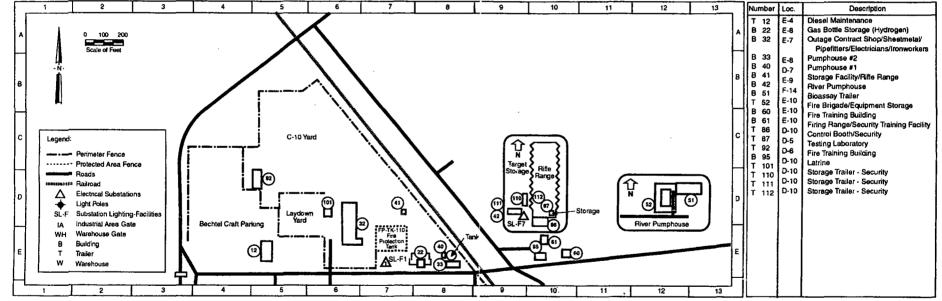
Site layout of the reference BWR plant facilities - Sheet 1
